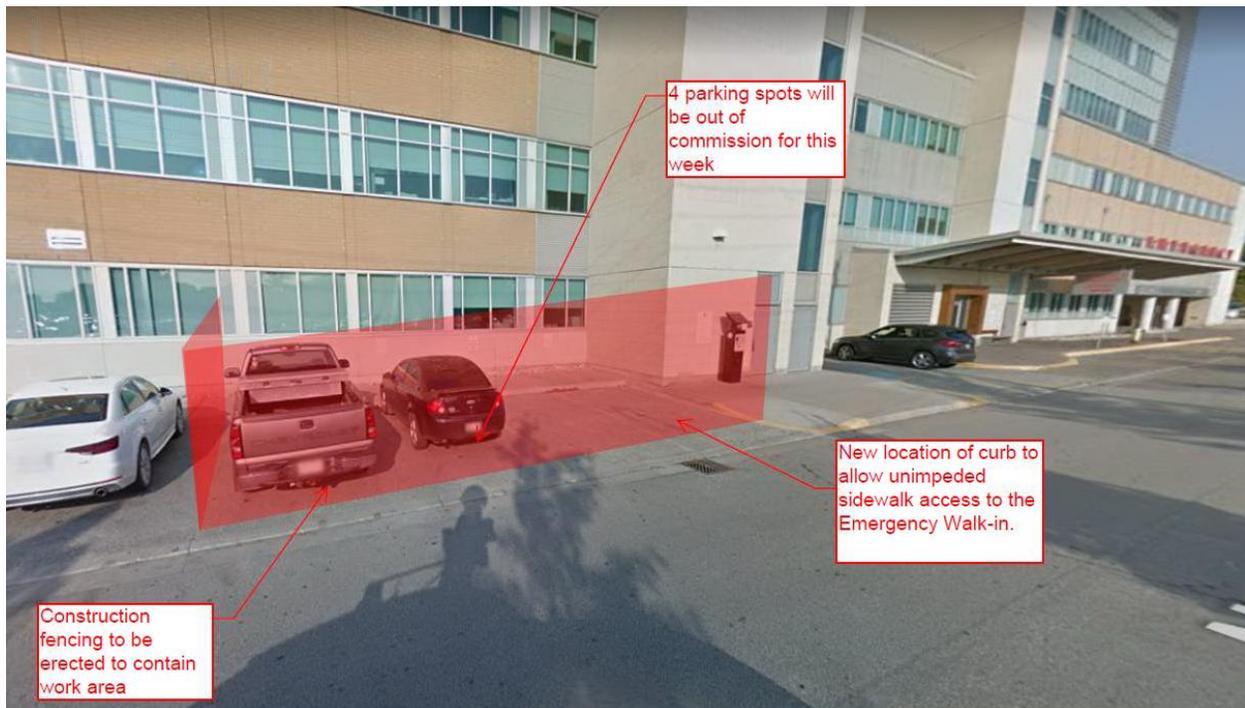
a picture of the identified location to have an accessible sidewalk installed with the removal on one parking spot.
